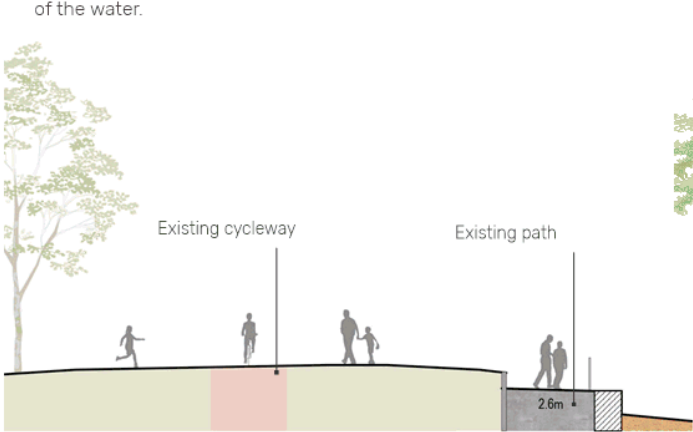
Section C - Existing - if northern promenade is retained (Scale 1:200) Section A (Scale 1:200)
